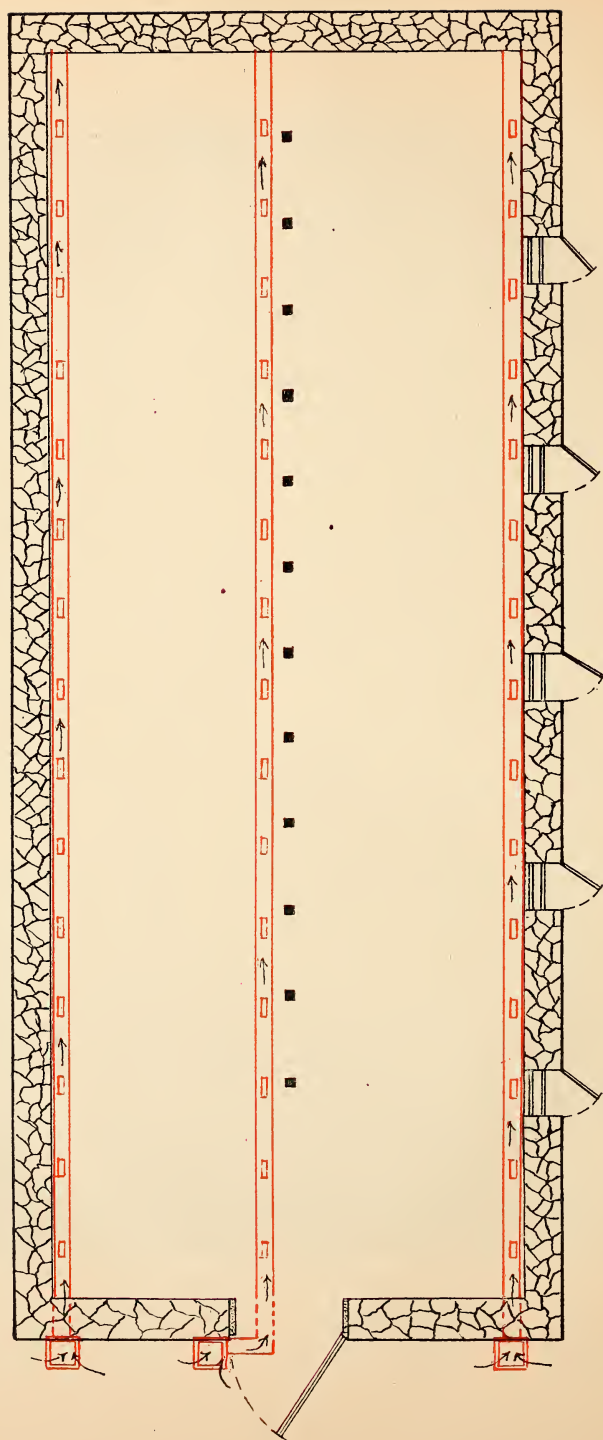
Storage chamber of Mr. R. N. Barber's apple house, showing ventilating ducts.
